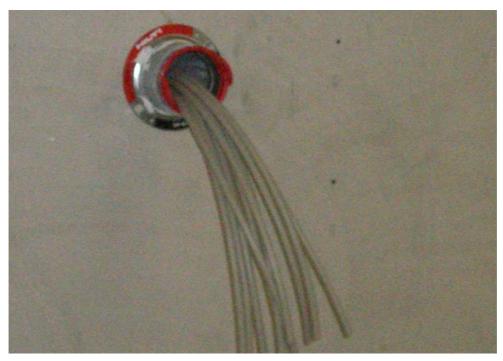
4" cable penetration assembly with 10 cable pieces each
